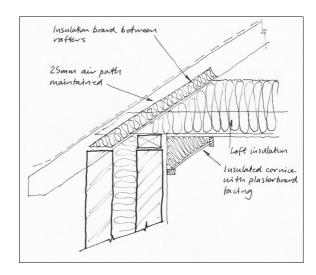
Proposed eaves detail showing special insulating cornice to reduce cold bridging at wall/roof junctions – illustration shown relates to Grebe
